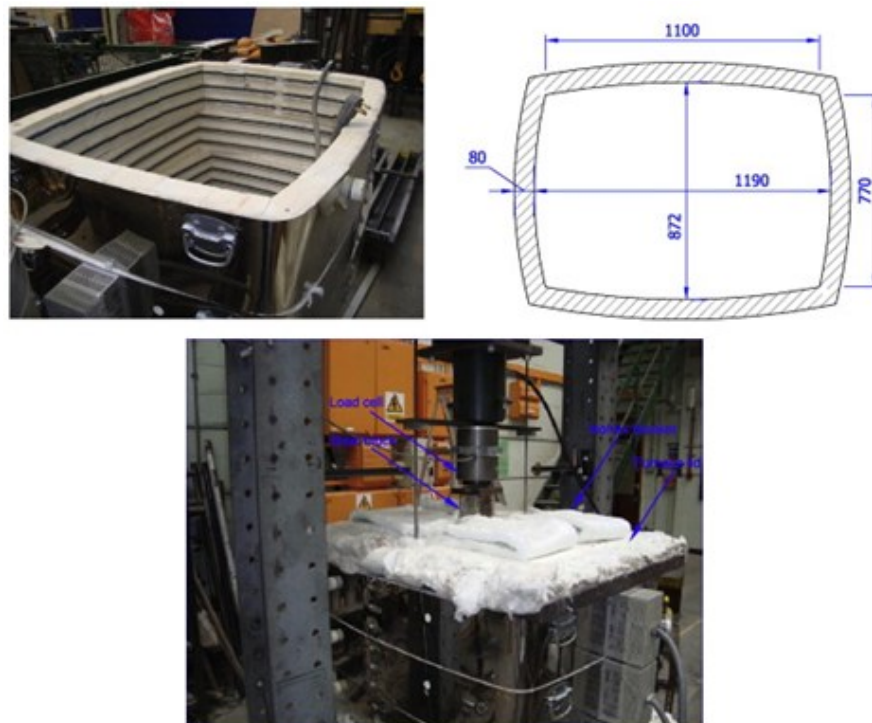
Wallettes testing set-up by Al-Sibahy and Edwards [70] (Credit line: Elsevier, Engineering Structures, Behaviour of masonry wallettes made from a new concrete formulation under combination of axial compression load and heat exposure: Experimental approach, Adnan Al-Sibahy, Rodger Edwards, March 1, 2013, License Number: 5022841389494)
